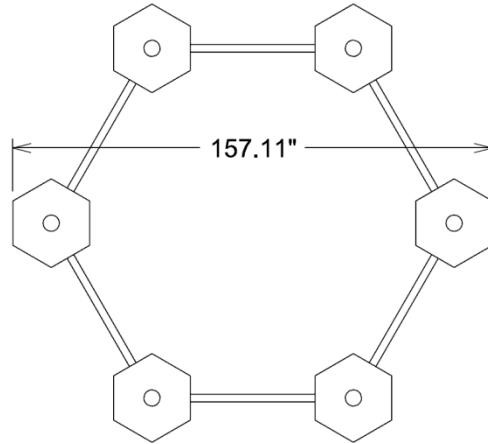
HCUP Tower Cross-Section at 220 ft (67 m)
